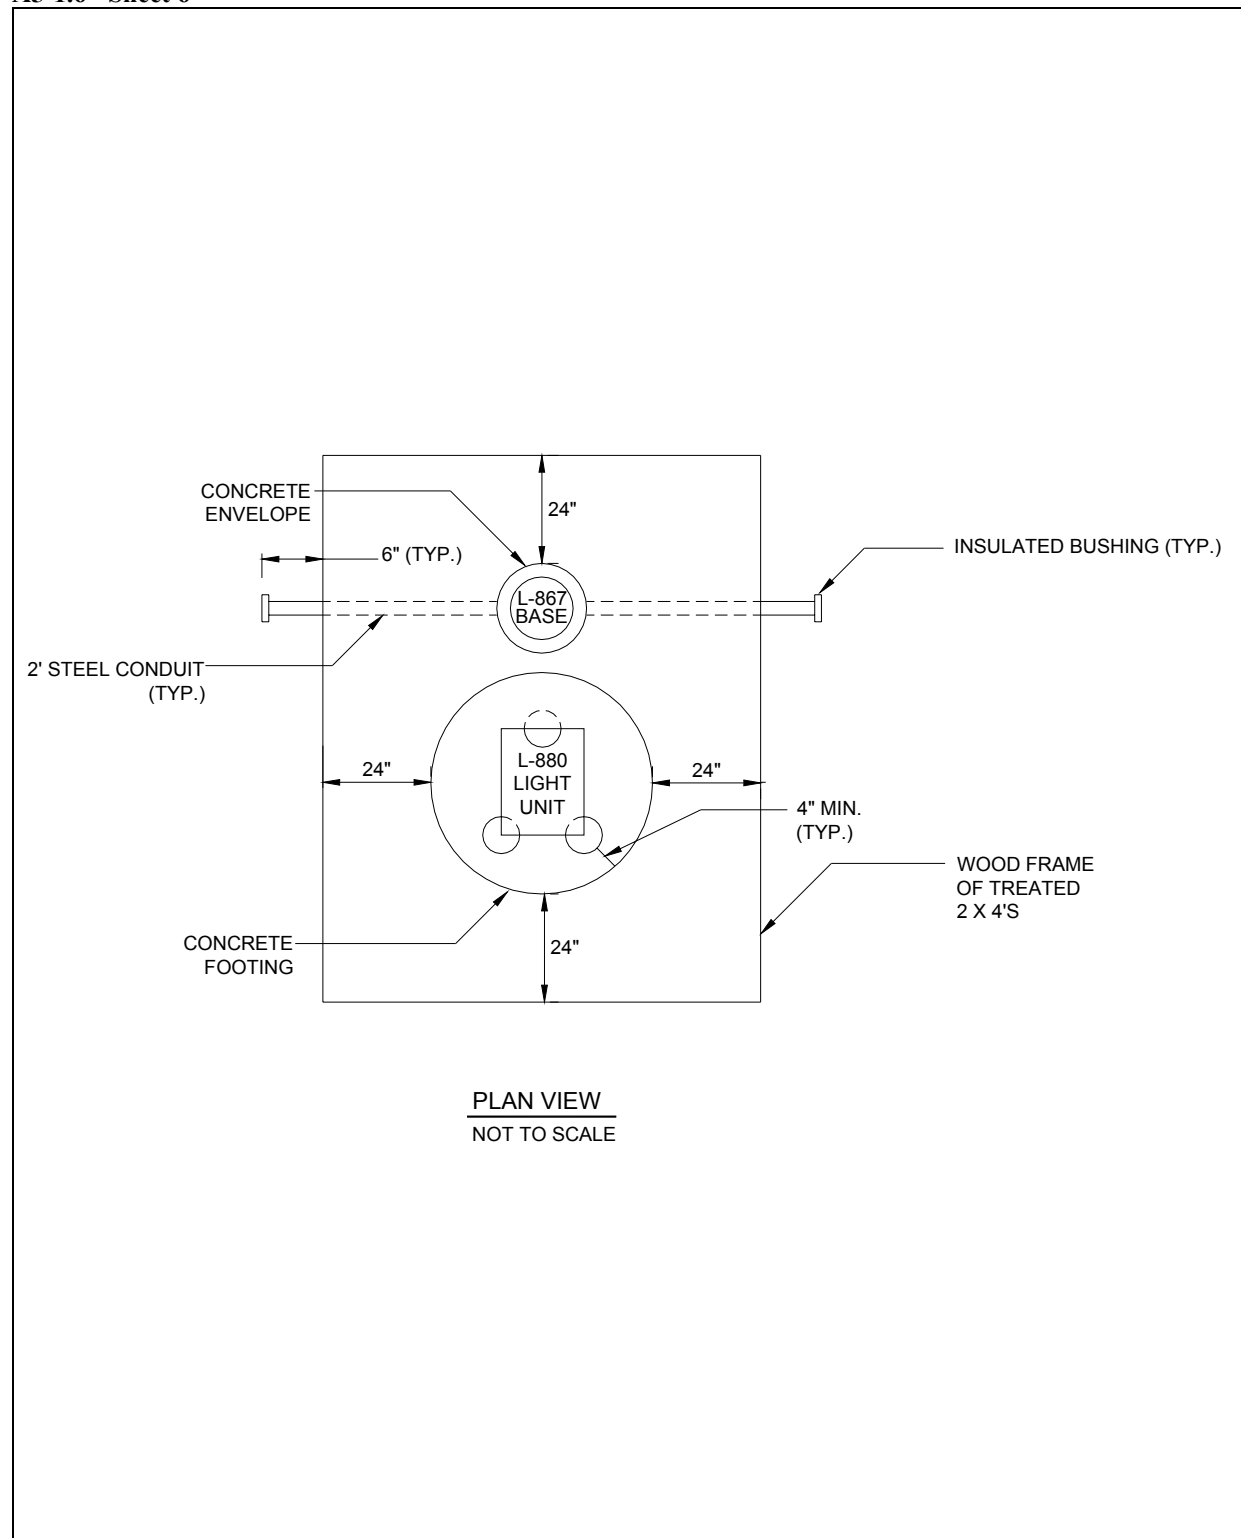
Standard Details for Precision Approach Path Indicators (PAPIs) – GL-600 Sheet 6A – Plan View
